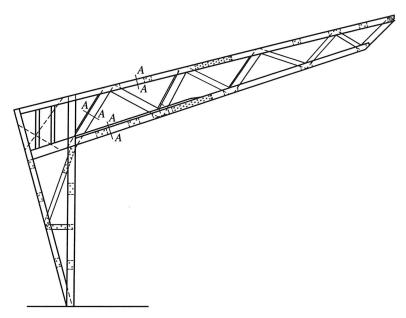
One half of a three-hinged truss frame, spanning 15,5 m, with joints at A-A
